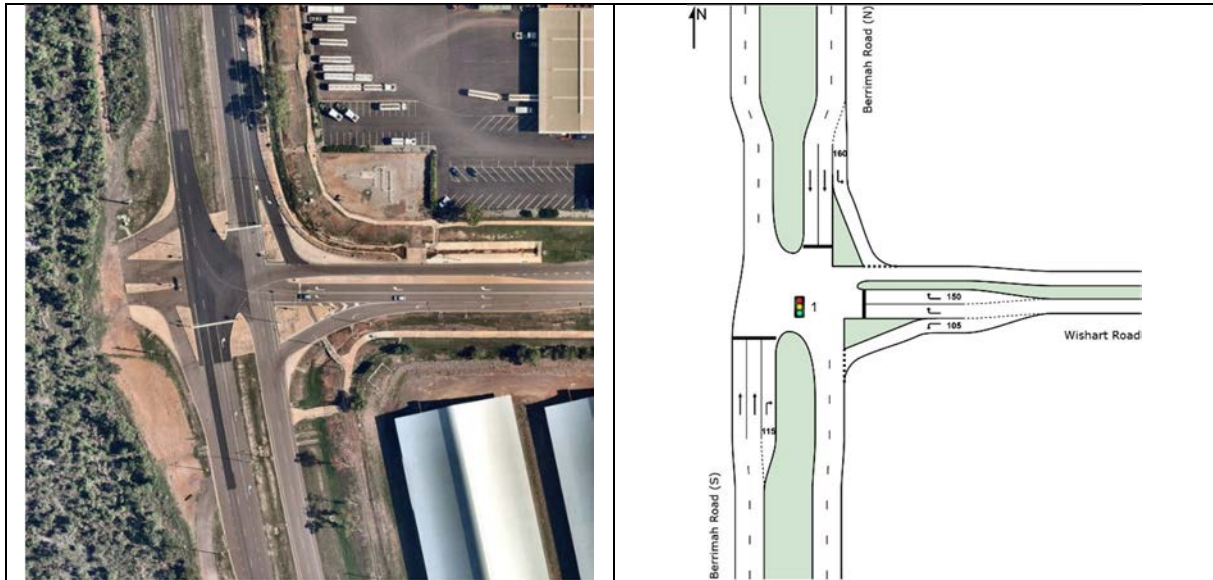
Berrimah Road / Wishart Road intersection – Aerial view and SIDRA layout
